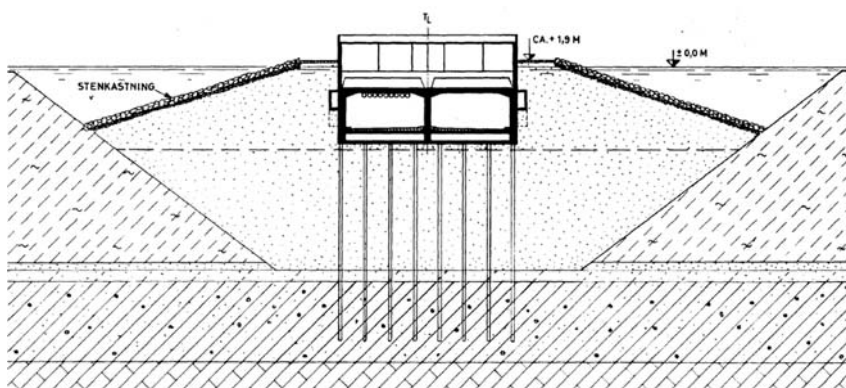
Cross section in tunnel trench at the northern portal building.
